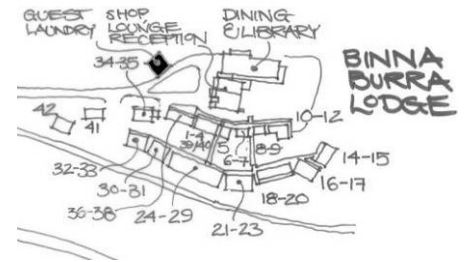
Location plan; Guest Laundry 2009. (RA)
